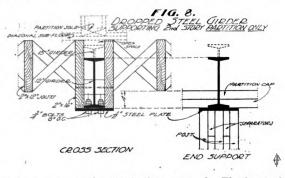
shows the proper placement and end support for a second-floor girder in case B; for the support of a second-story partition only, but not being entirely concealed in the floor-construction. The girder is here dropped below the lower edge of the joists by an amount exactly equalling the thickness of the partition-cap—4 in. The two parallel joists, resting upon the continuous steel plate through which the girder receives its partition-load, are therefore made 4 in. deeper than the regular floor-joists, and no horizontal timber is interposed between the end-bearing of the girder and its vertical post. Equable shrinkage-
